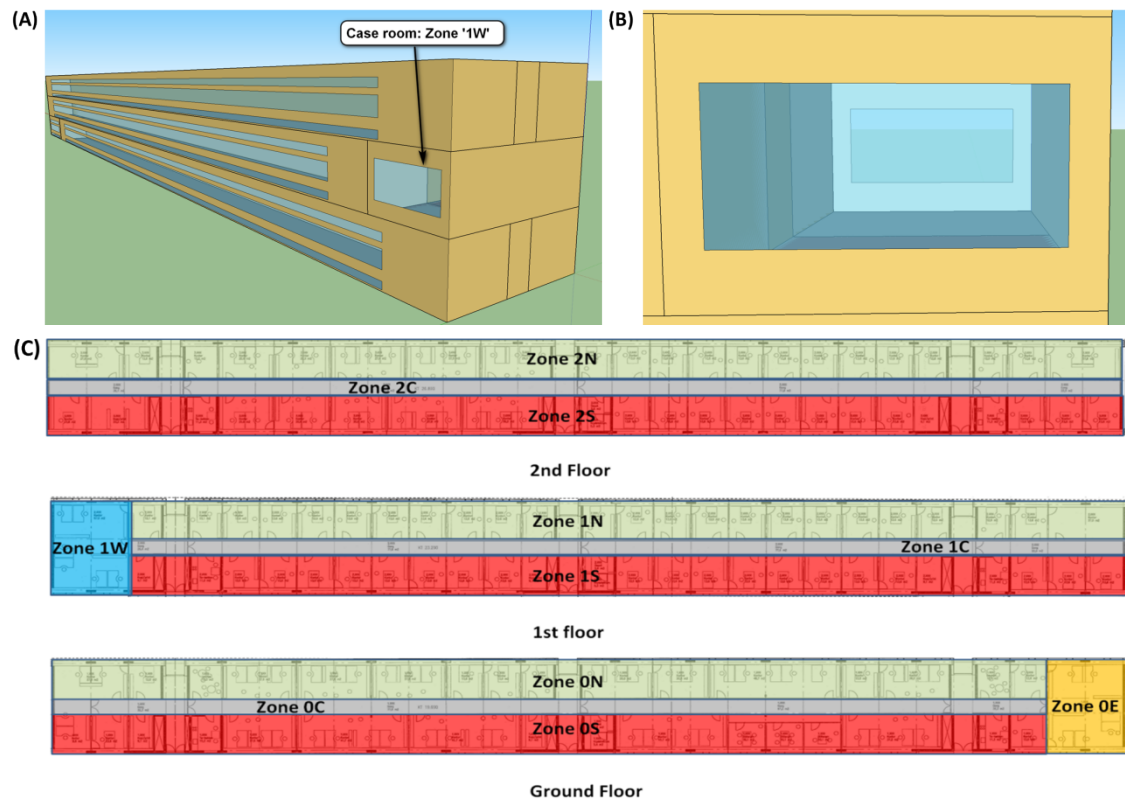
(A)(B) View of the building and case room, (C) layout of the case office building.
